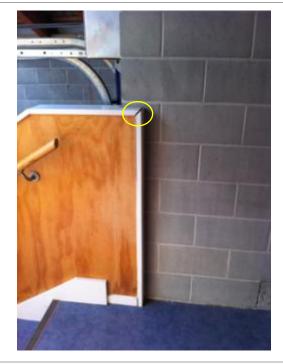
Mitre Joints in Wooden Balustrade Trim have Opened up
